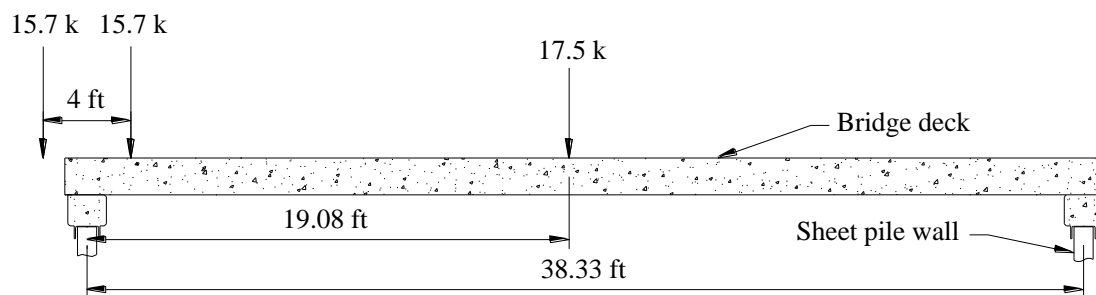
Location of Truck 48 wheel loads for Run A, location 5
